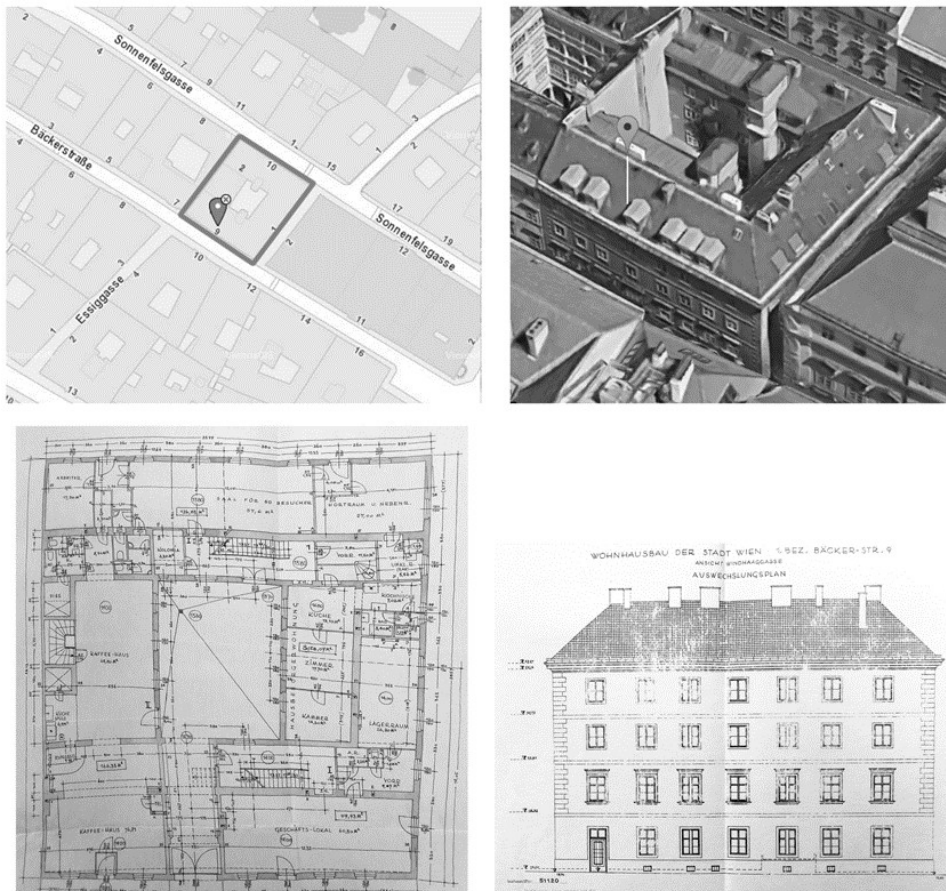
Building case 1 - Bäckerstraße 9, 1010 Vienna-Austria
